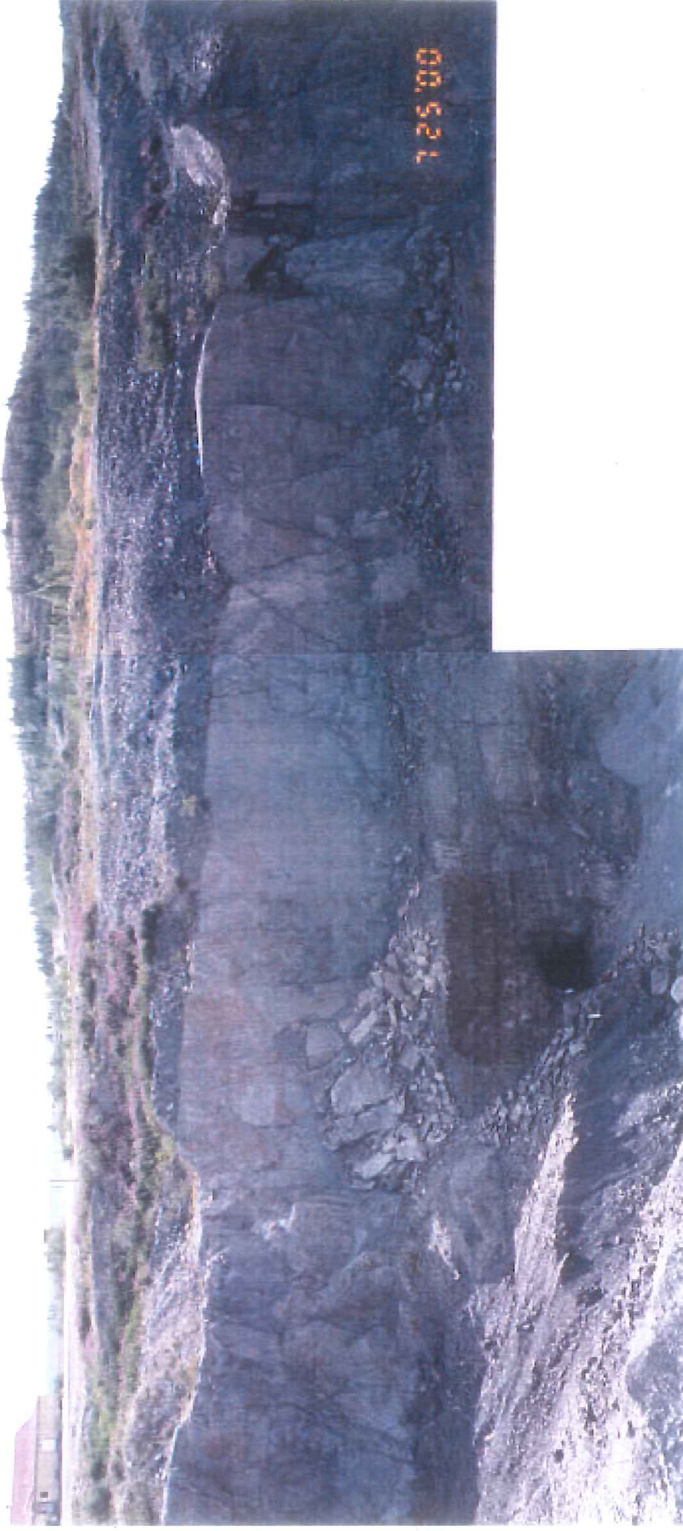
East pit wall. Opening to underground is to be plugged at closure of underground operation.
